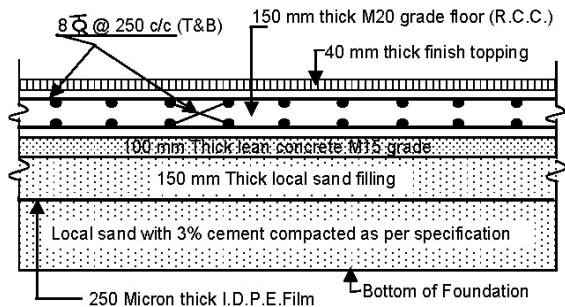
Typical Details of Backfilling—Plinth Protection/Grade Slab
